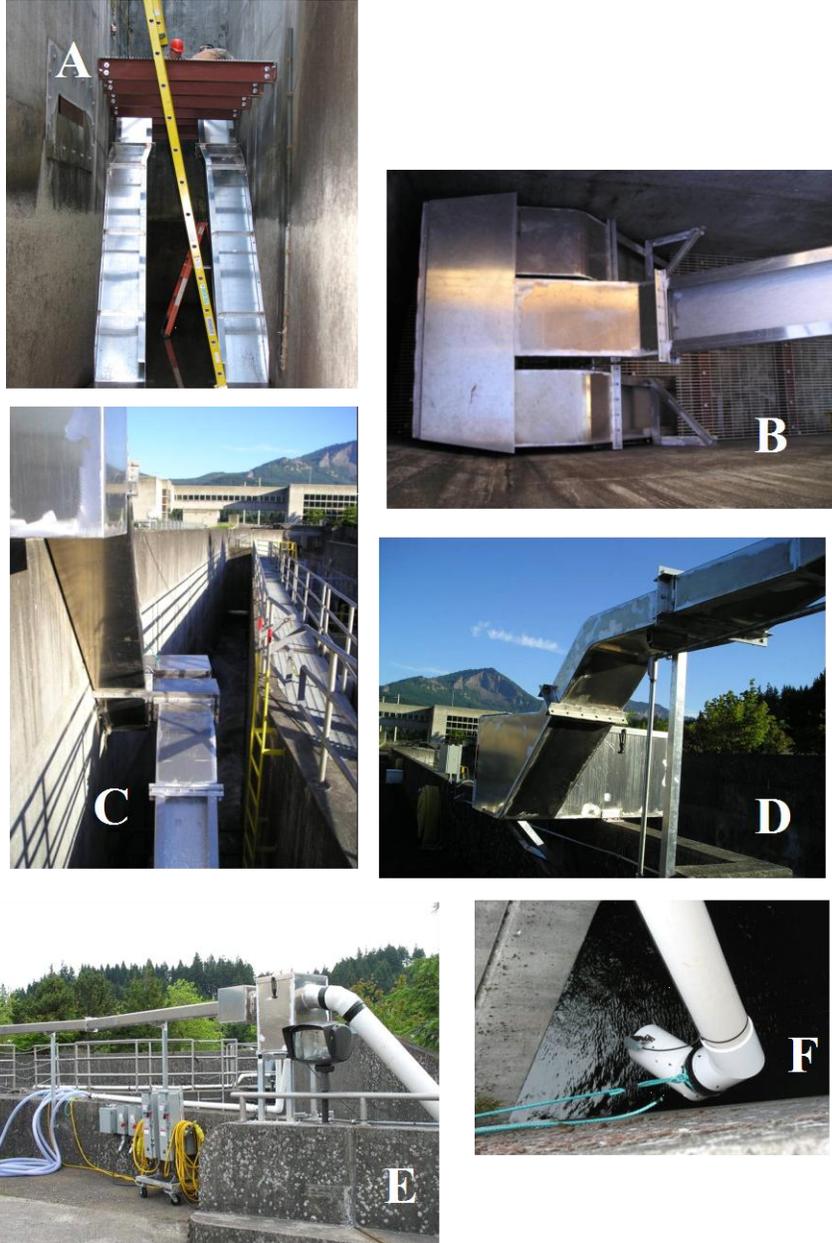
Photos of the Washington Shore AWS LPS showing dual collector ramps (A) leading up to large rest box (B), to a second rest box and PIT detector (C), to a third rest box (D), to the exit PIT detector and upwelling box (E) and exit slide/counter (F).
